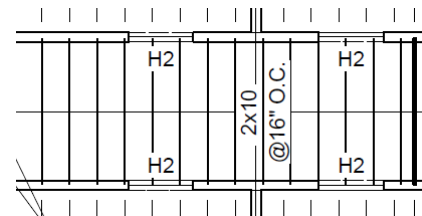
Typical corridor at 7' 2" wide (Plans S1.3A)
